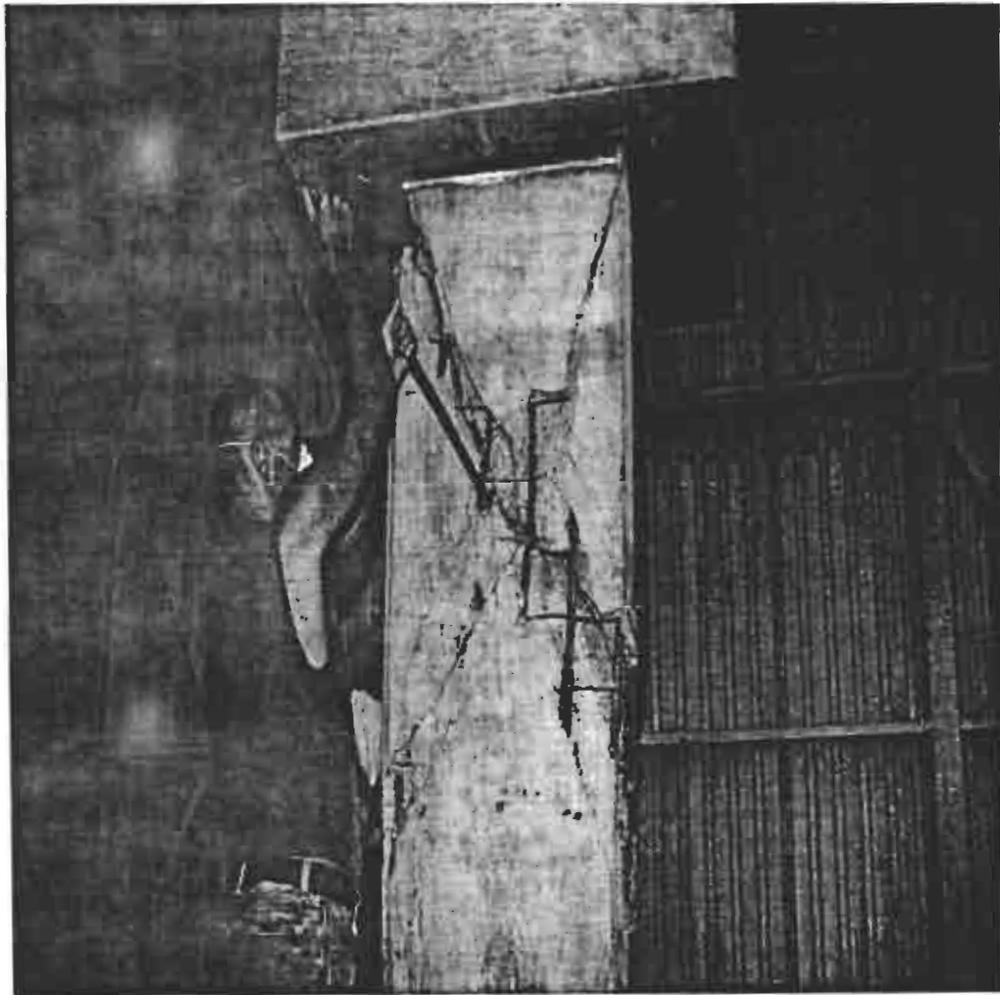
Failure of As-built Shear Enhancement Rectangular Column
